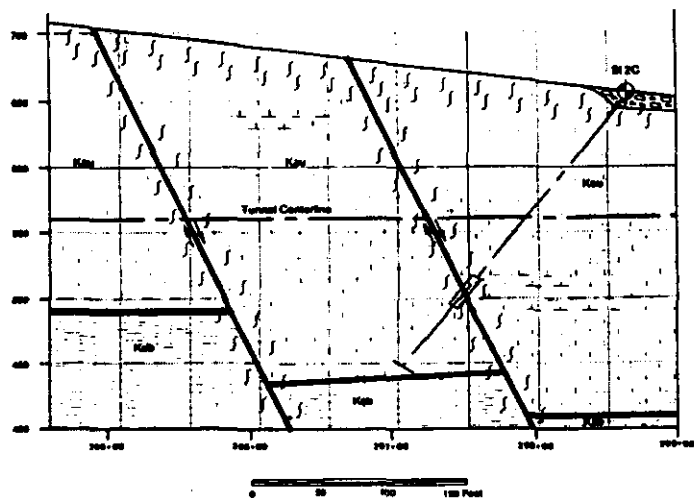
CROSS-SECTION THROUGH A TYPICAL FAULT STRUCTURE IN THE SSC SITE VICINITY
